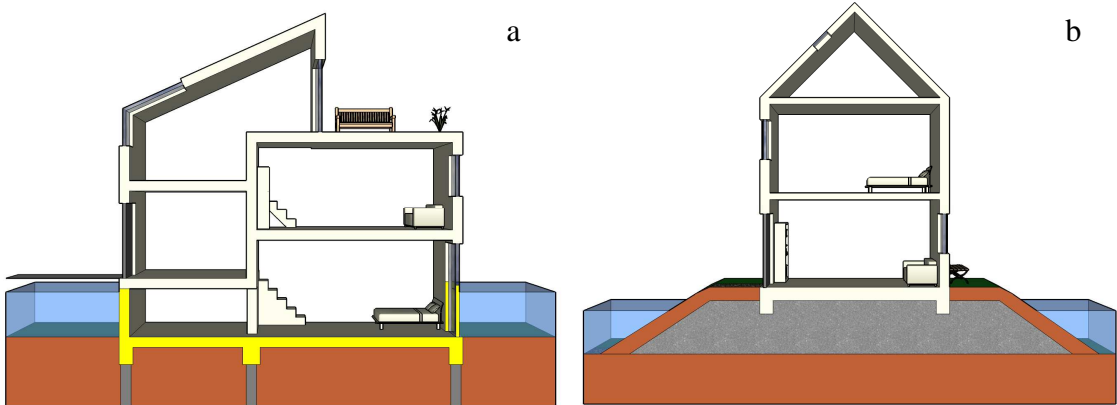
Flood proof house with glass walls (a) and Flood proof house on a dike or elevated area (b) (Xplorelab, 2008).
